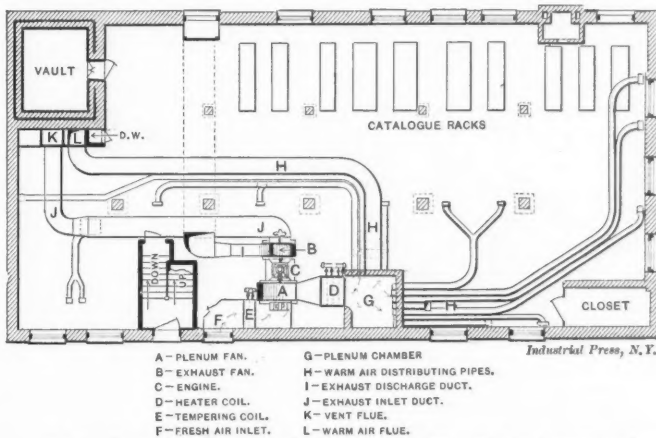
Basement Plan, showing Heating and Ventilating Apparatus.
